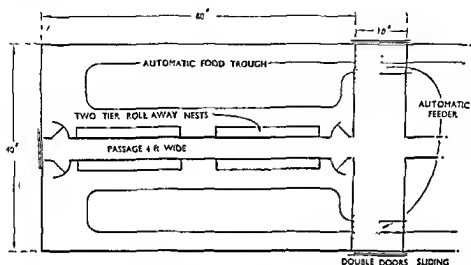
PLAN OF ALL-WIRE FLOOR HOUSE
